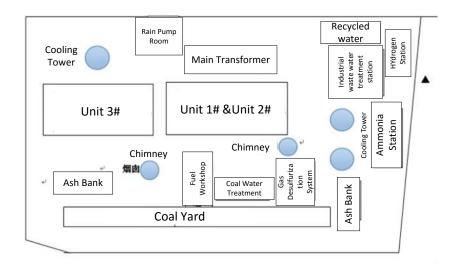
General Layout of the Plant Area of State Power Luanhe Power Plant
